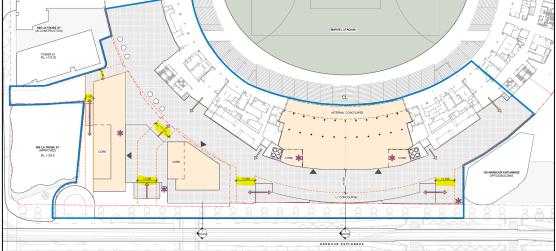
Location of the 3 pedestrian access points from Harbour Esplanade which has a minimum width of 12 metre (source: Applicant's Development Envelope Drawings associated with the Master Plan)
